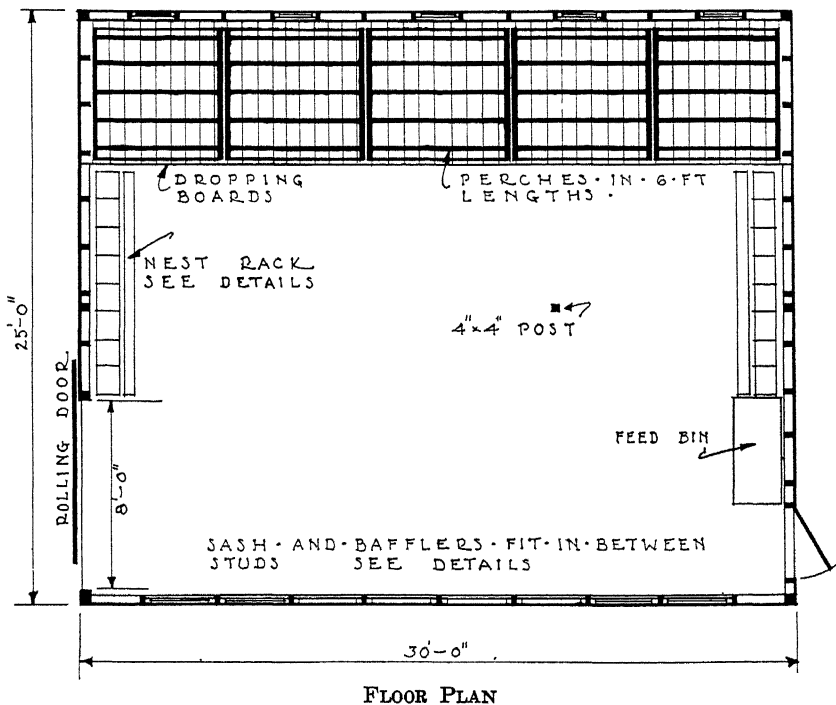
Locations of feed bin and nest racks are shown. All windows fit in between studs. Face house south or southeast.
